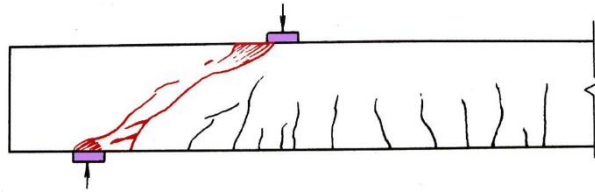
Shear compression failure - Shear strength depends on concrete strength under bi-axial loads
